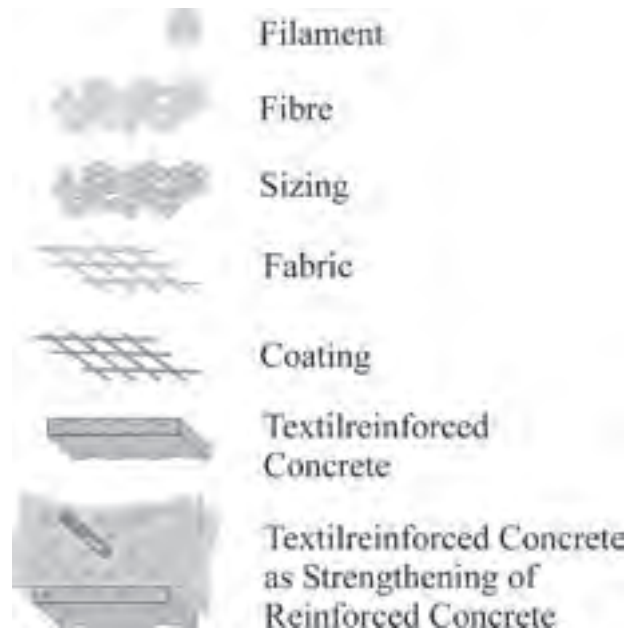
Assembly of textile-reinforced concrete as strengthening element for reinforced concrete structural elements
